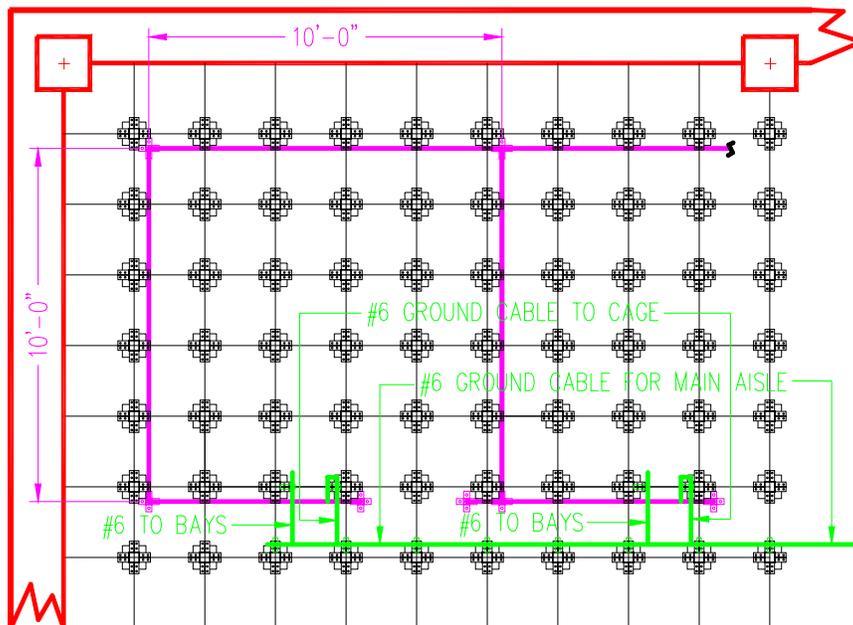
TYPICAL RAISED FLOOR CAGED COLLOCATION GROUNDING
